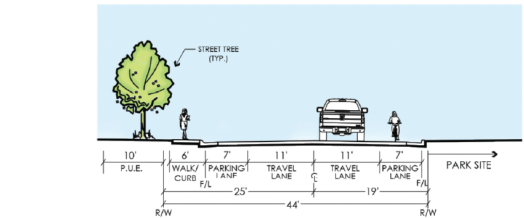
INTERIOR COLLECTOR ROAD (PARK FRONTAGE)
